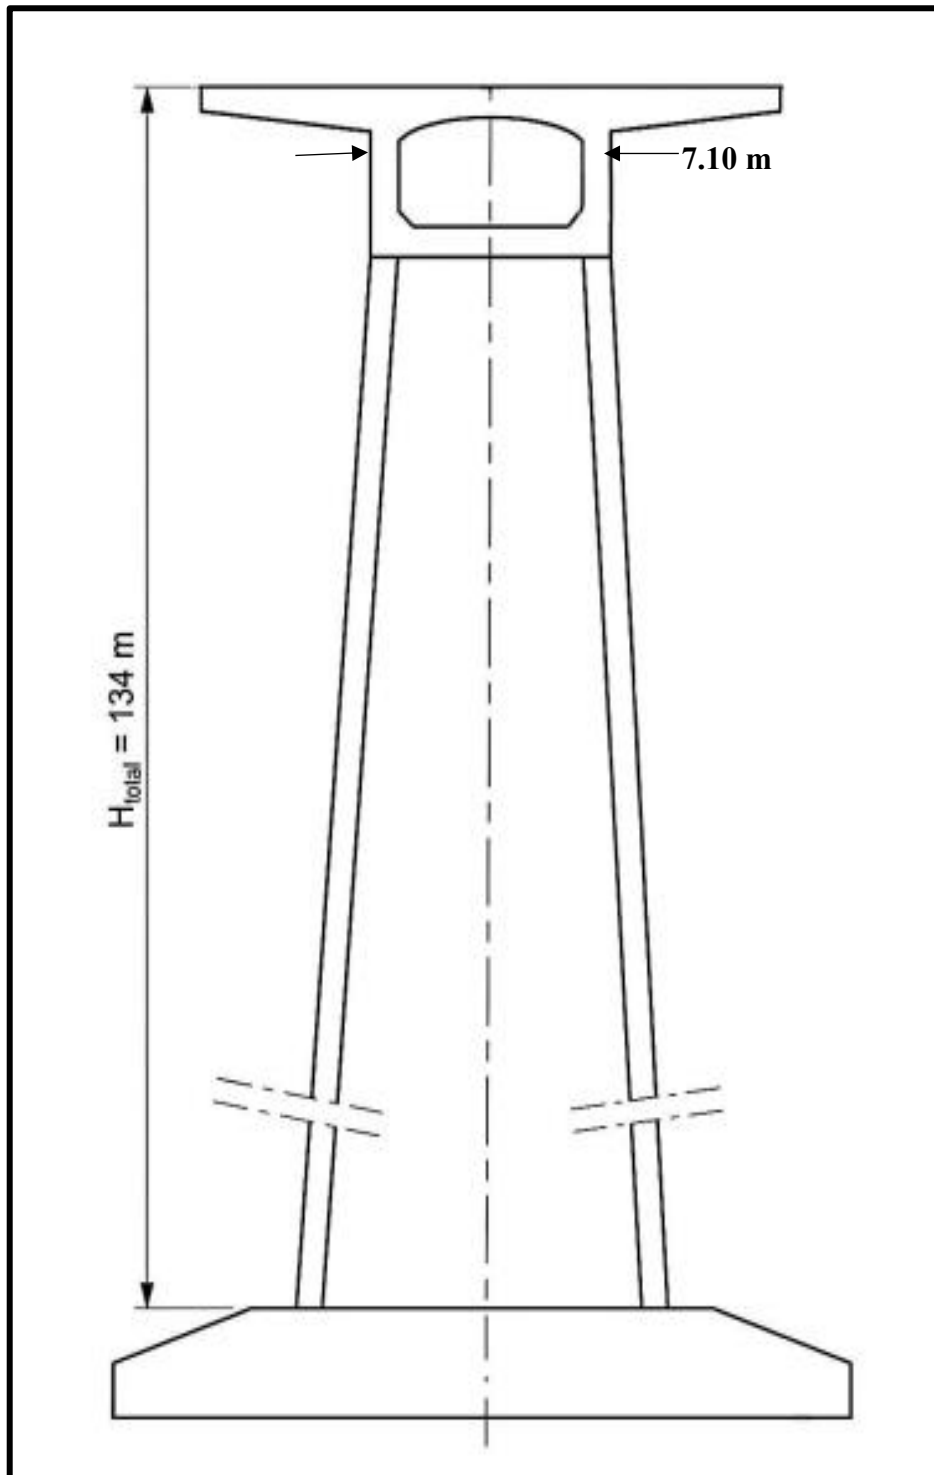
Structural Elevation of Bridge Pier and Foundation Details
